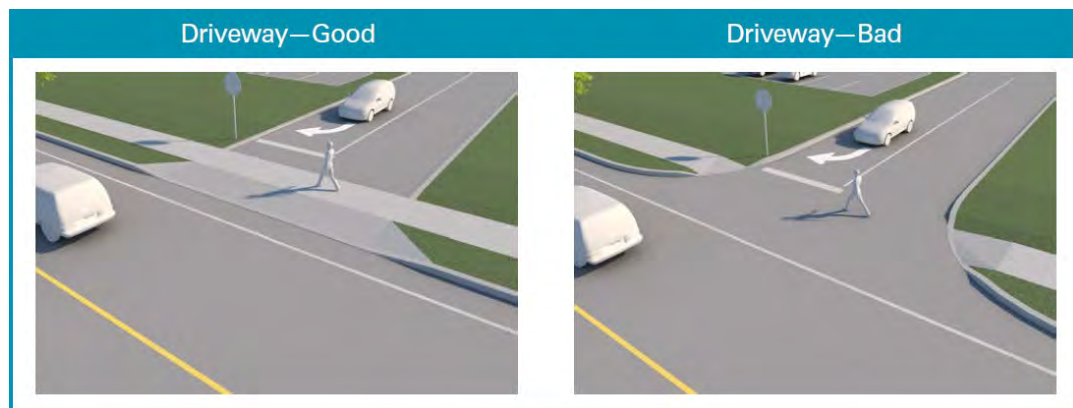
Sidewalk and Driveways (Source: CSDG)
